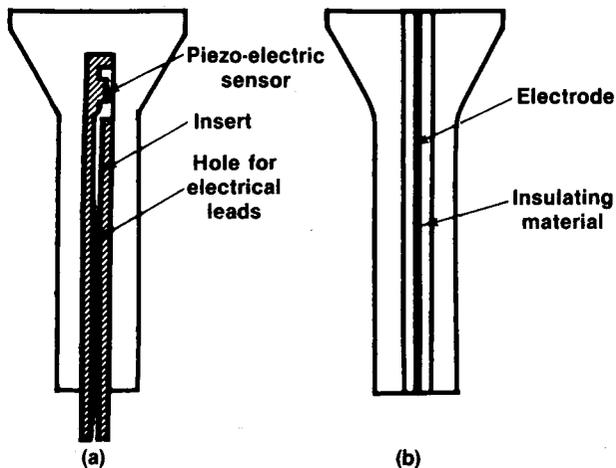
Instrumented bolts showing (a) a bolt with a piezo-electric sensor for detecting mechanical disturbances, and (b) a bolt for measuring electrical conduction
